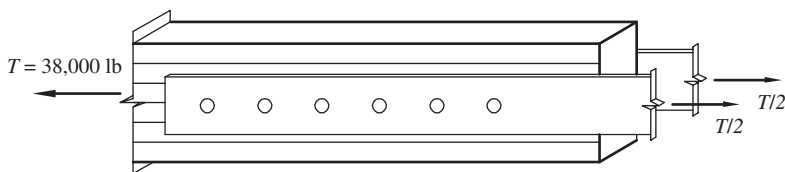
Tension splice connection—Example 13.2.6-1.
